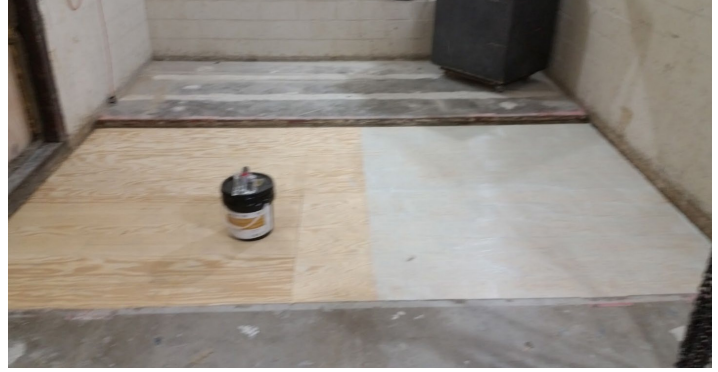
Plywood subfloor installed, adhesive partially installed over plywood
